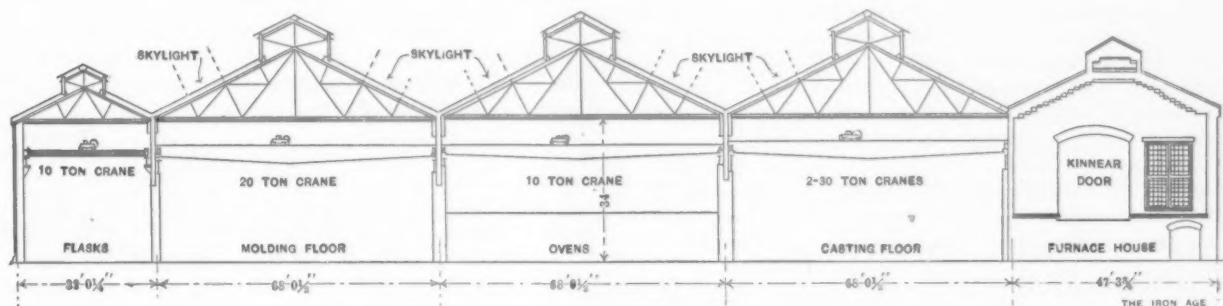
Cross Section of the Baldt Steel Company's Plant.
